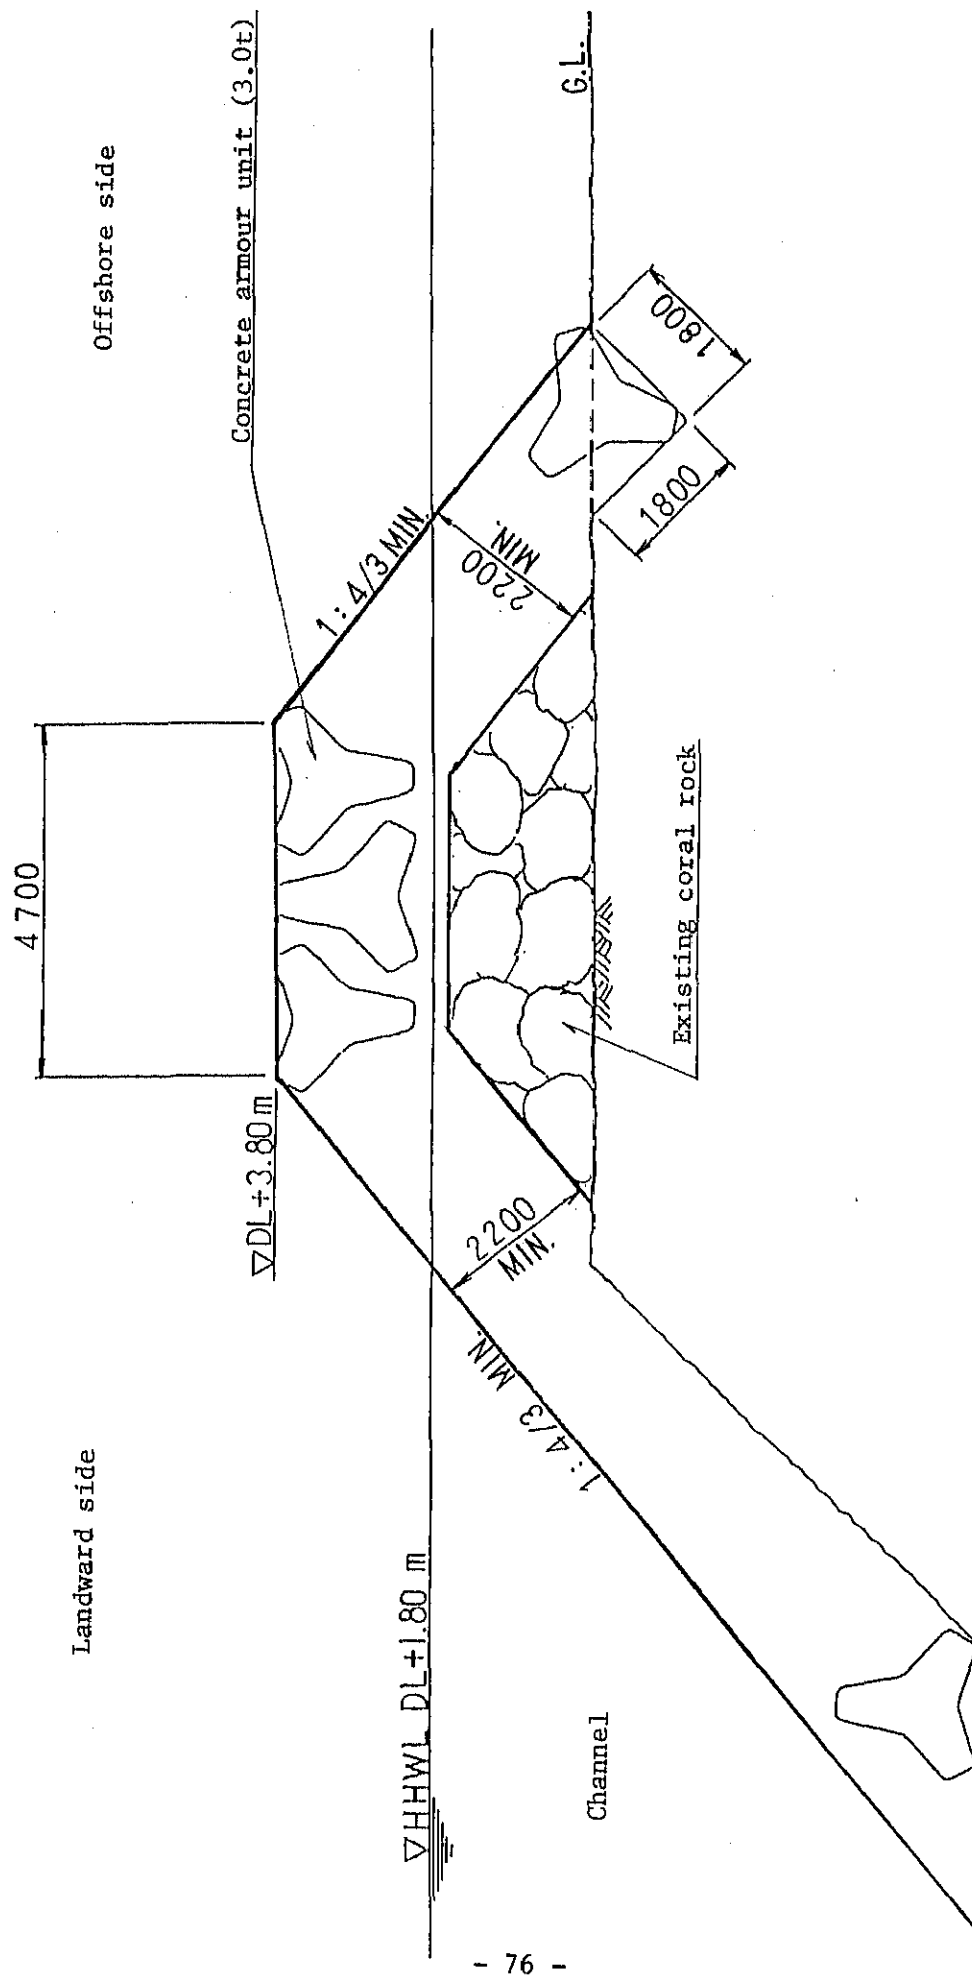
Typical section of detached breakwater in the vicinity of the survey lines No.12 and No.16.
